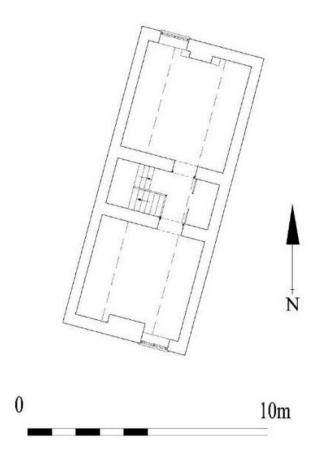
Main House and Buildings H and I second floor plan Modified from David Granger Architects drawings
